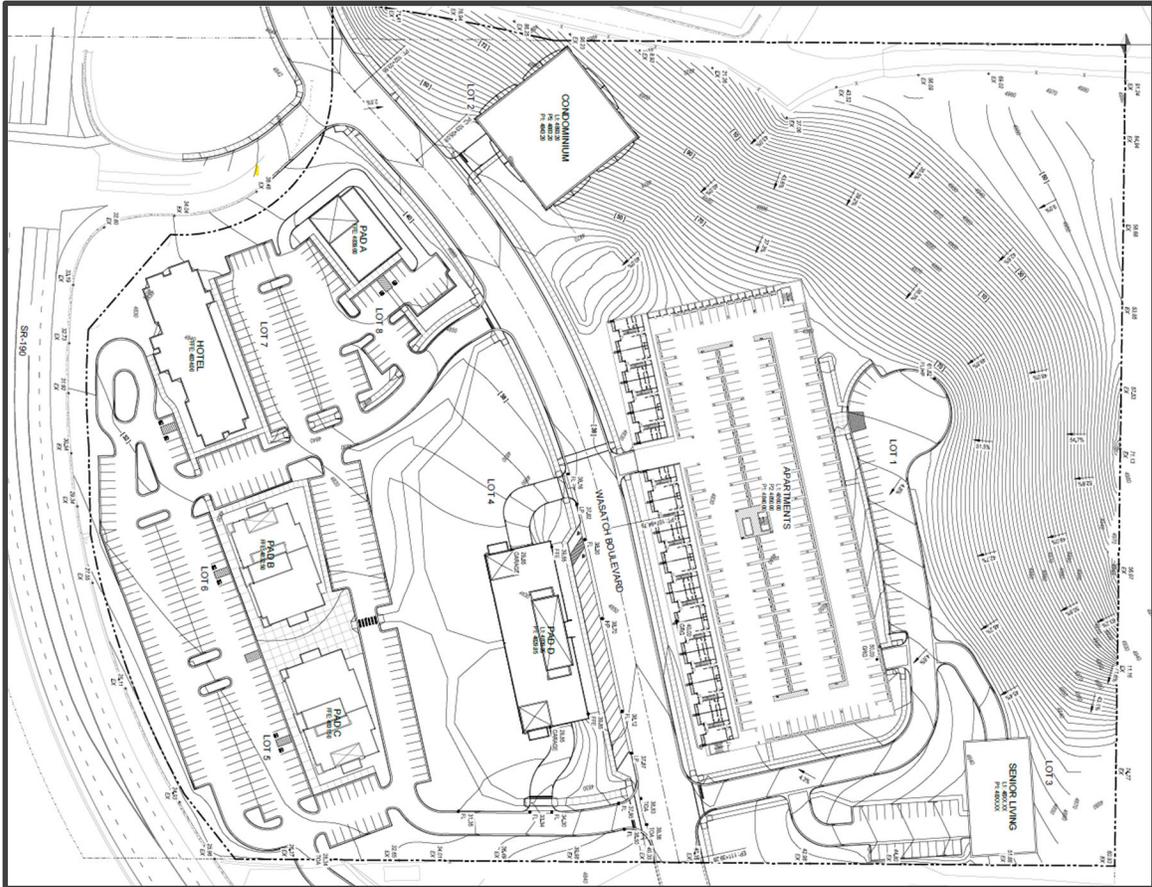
EXISTING AND PROPOSED SITE GRADING BASED ON OLD SITE PLAN LAYOUT.
